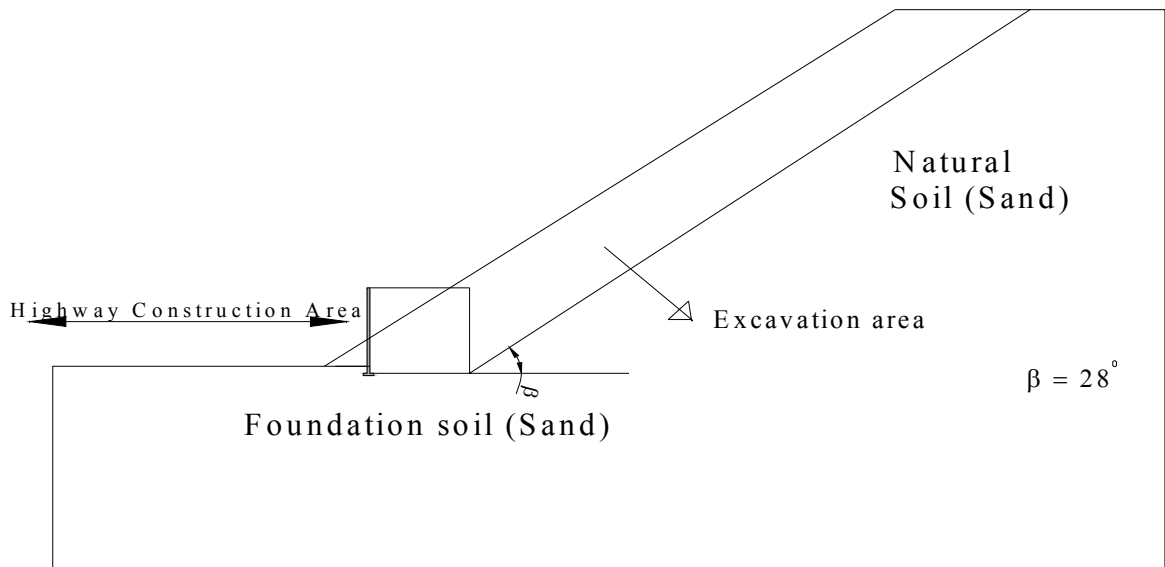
Position of model reinforced earth structure analyzed in Model 2
